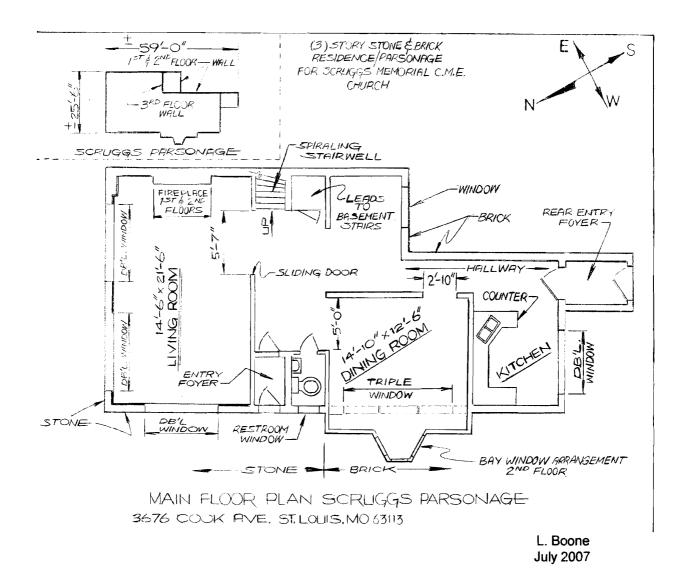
First floor plan parsonage, Cook Avenue M.E. Church, South St. Louis, Missouri
